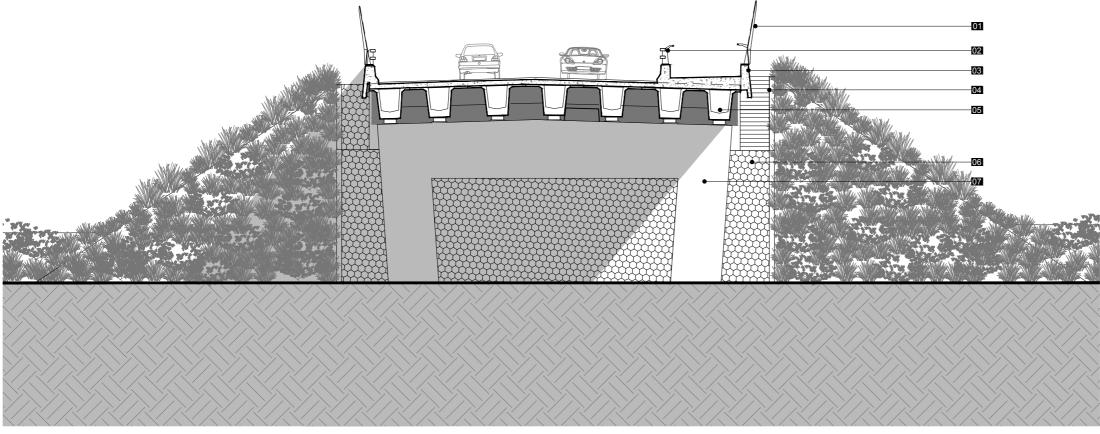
Bridge over Highway No.10 at Nambucca Heads Interchange: Elevation
